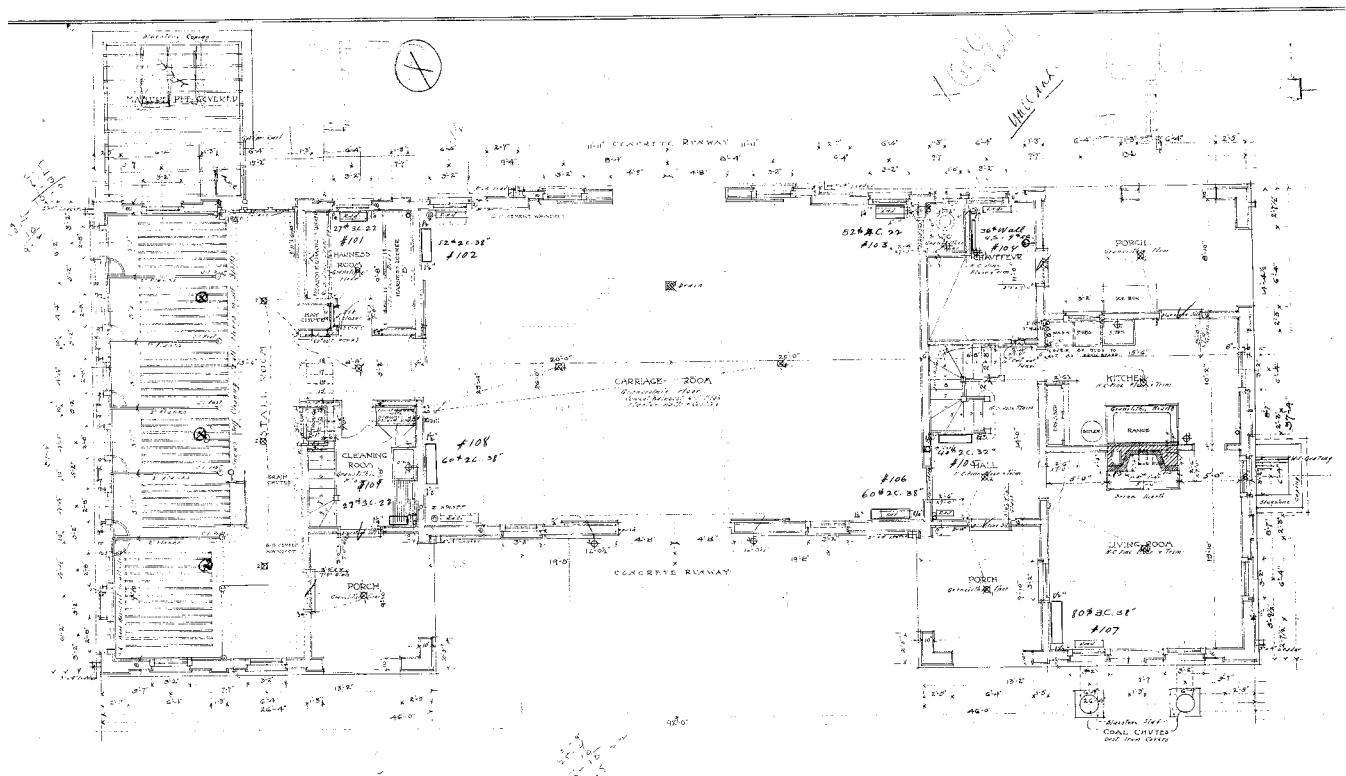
Original historic drawing of Carriage House ground floor plan. (Merestead archives)).
